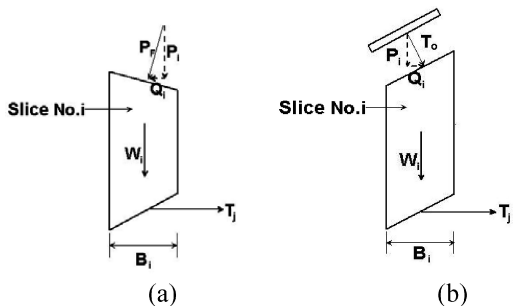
(a) Schematic figure of a slice subjected to the footing load and reinforcement force, (b) Schematic figure of a slice subjected to the reinforcement force and facing confinement.
